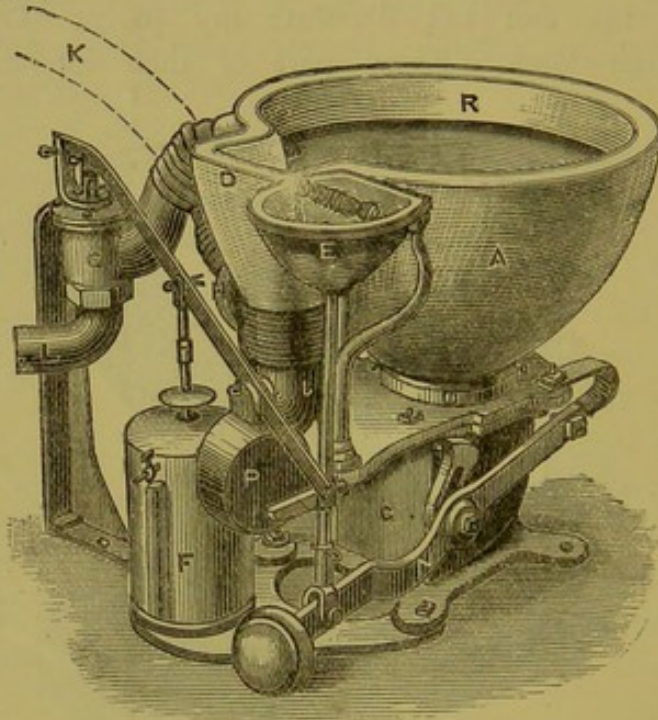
Side and partial view of the “Optimus” Valve-closet, with supply valve.
